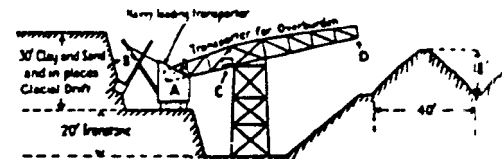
SHORT JIB EXTRACTOR AND TRANSPORTER
